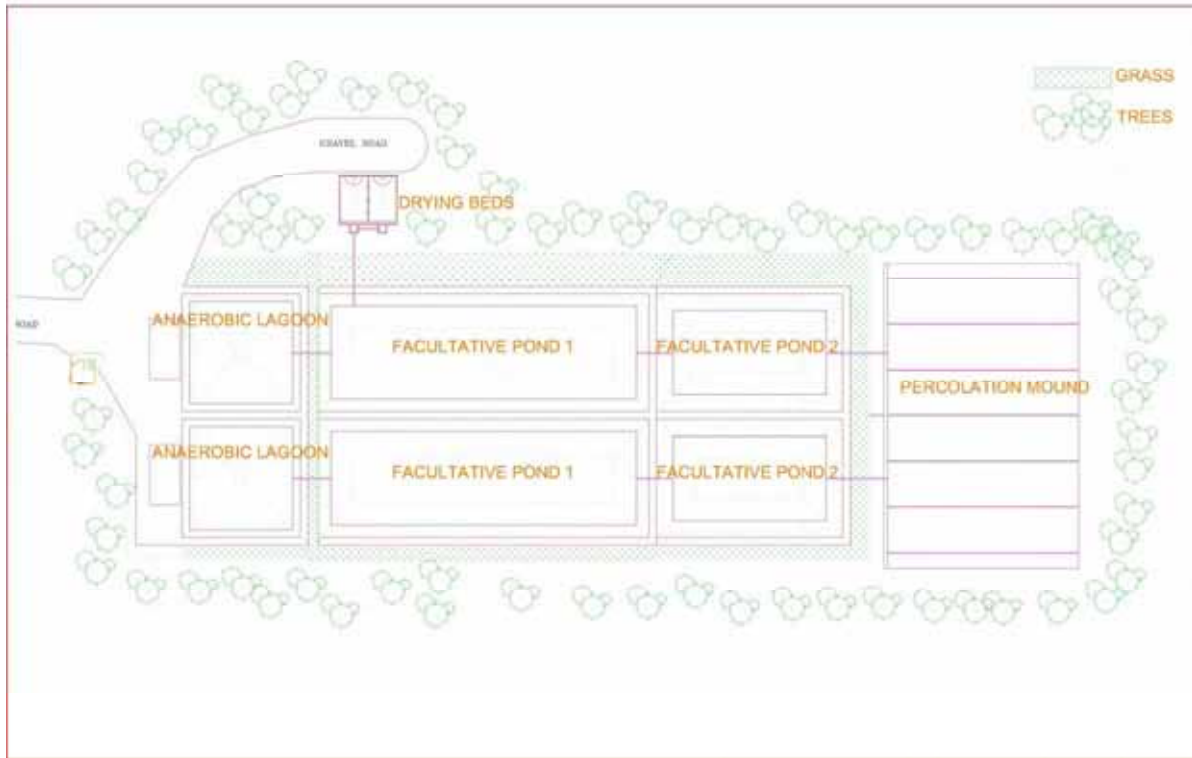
Layout Plan of Batticaloa NSTF
